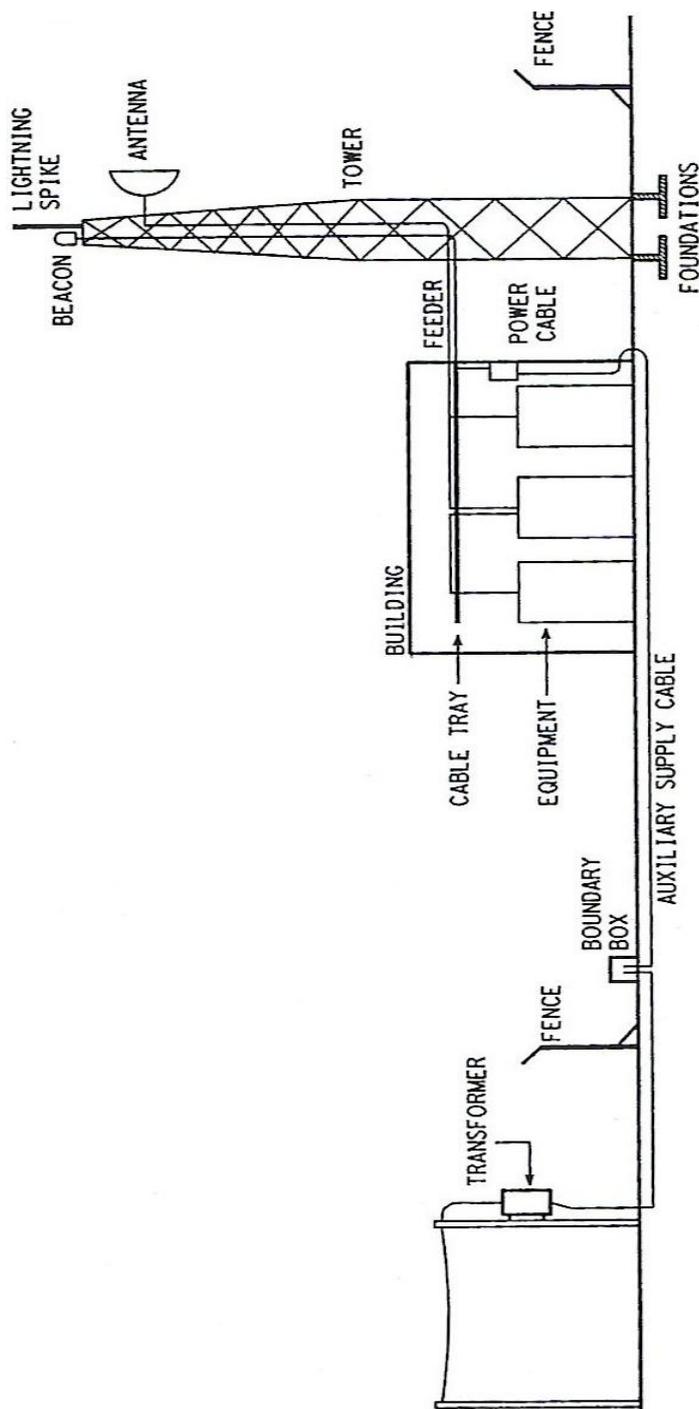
Organisation of Tower/Mast and Building Earthing – Plan
